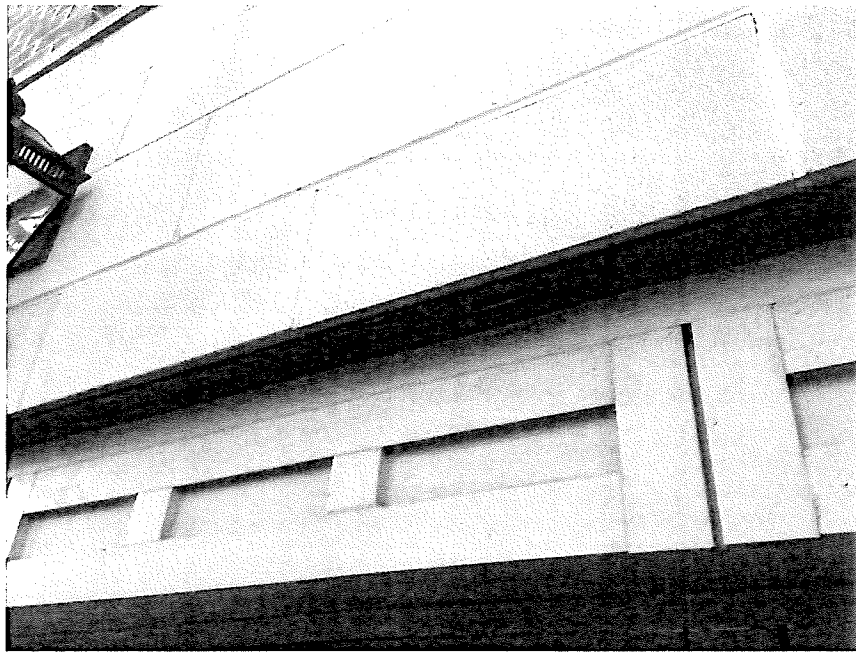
Missing dryer vent at 2319-3 Boston Street
